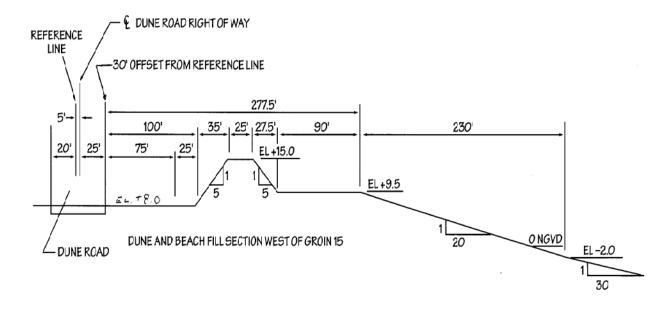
Minimum Design Cross Sections West of Groin 15. Offshore slope extends to the intersection with the existing bottom.
